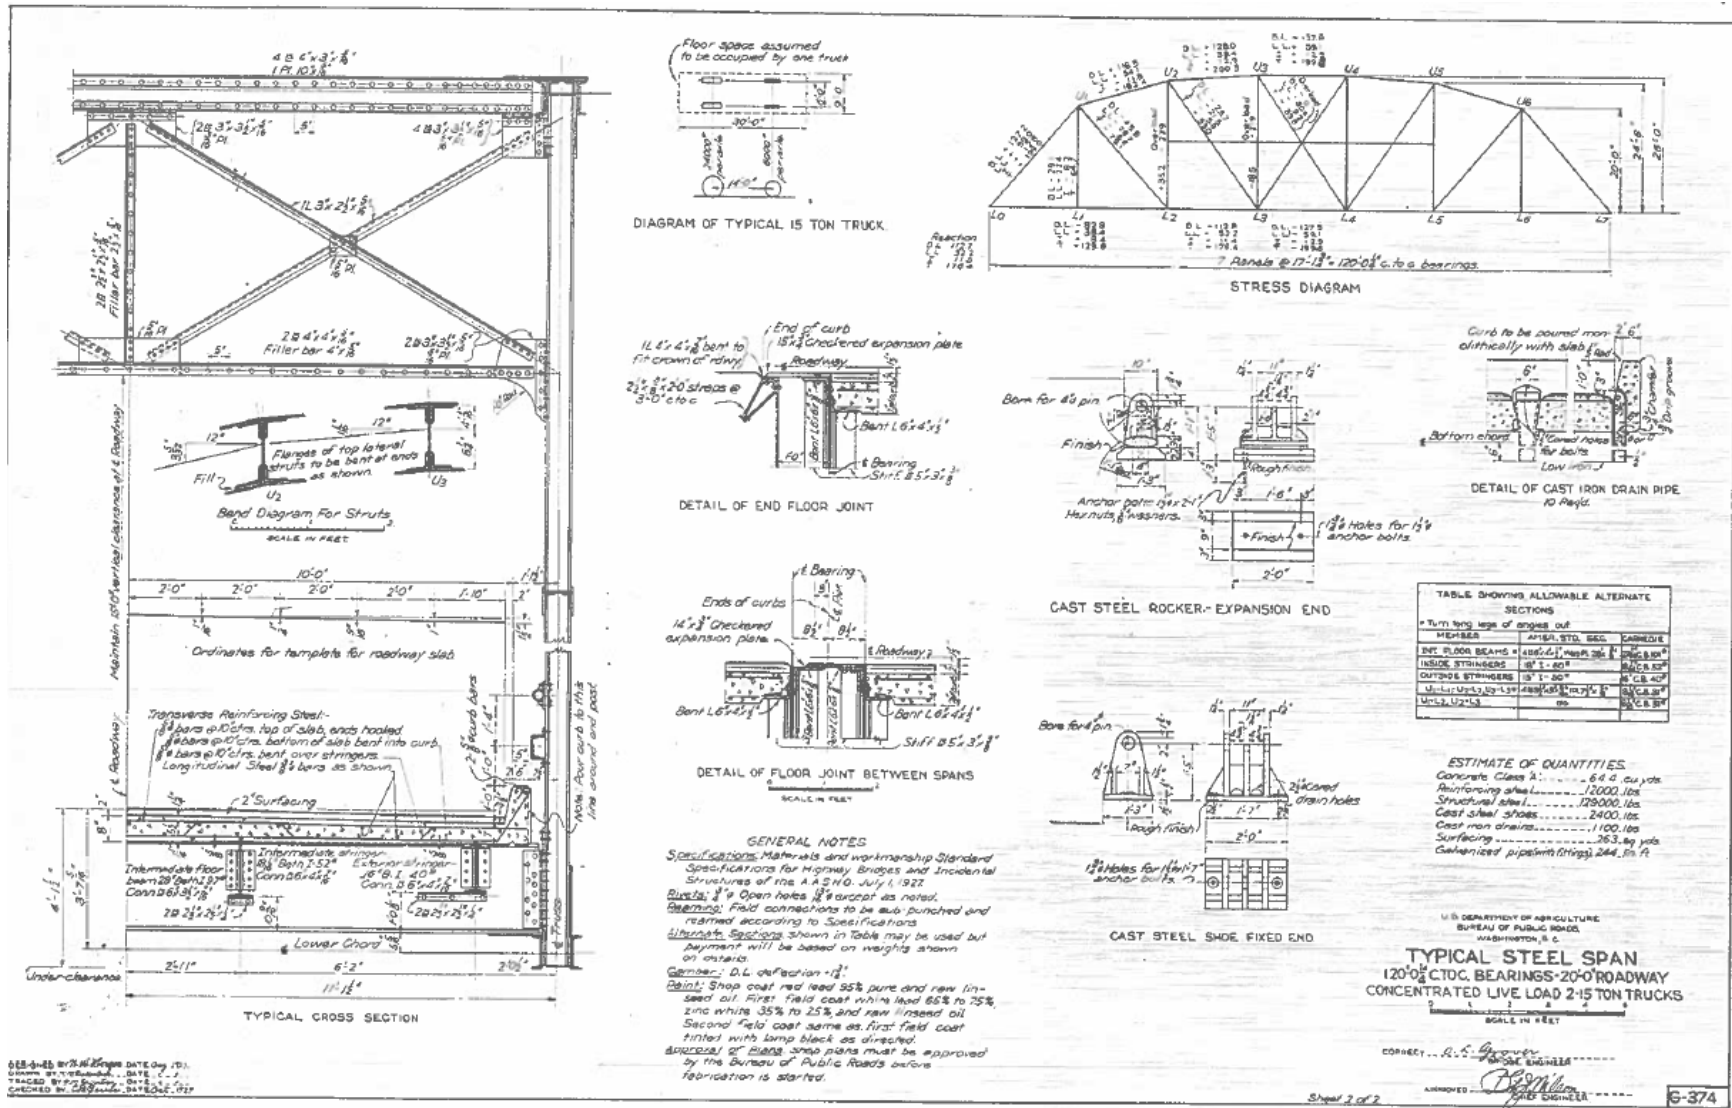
Sample 1929 steel truss span from the Bureau of Public Roads Typical Plans. Provided by WisDOT.
